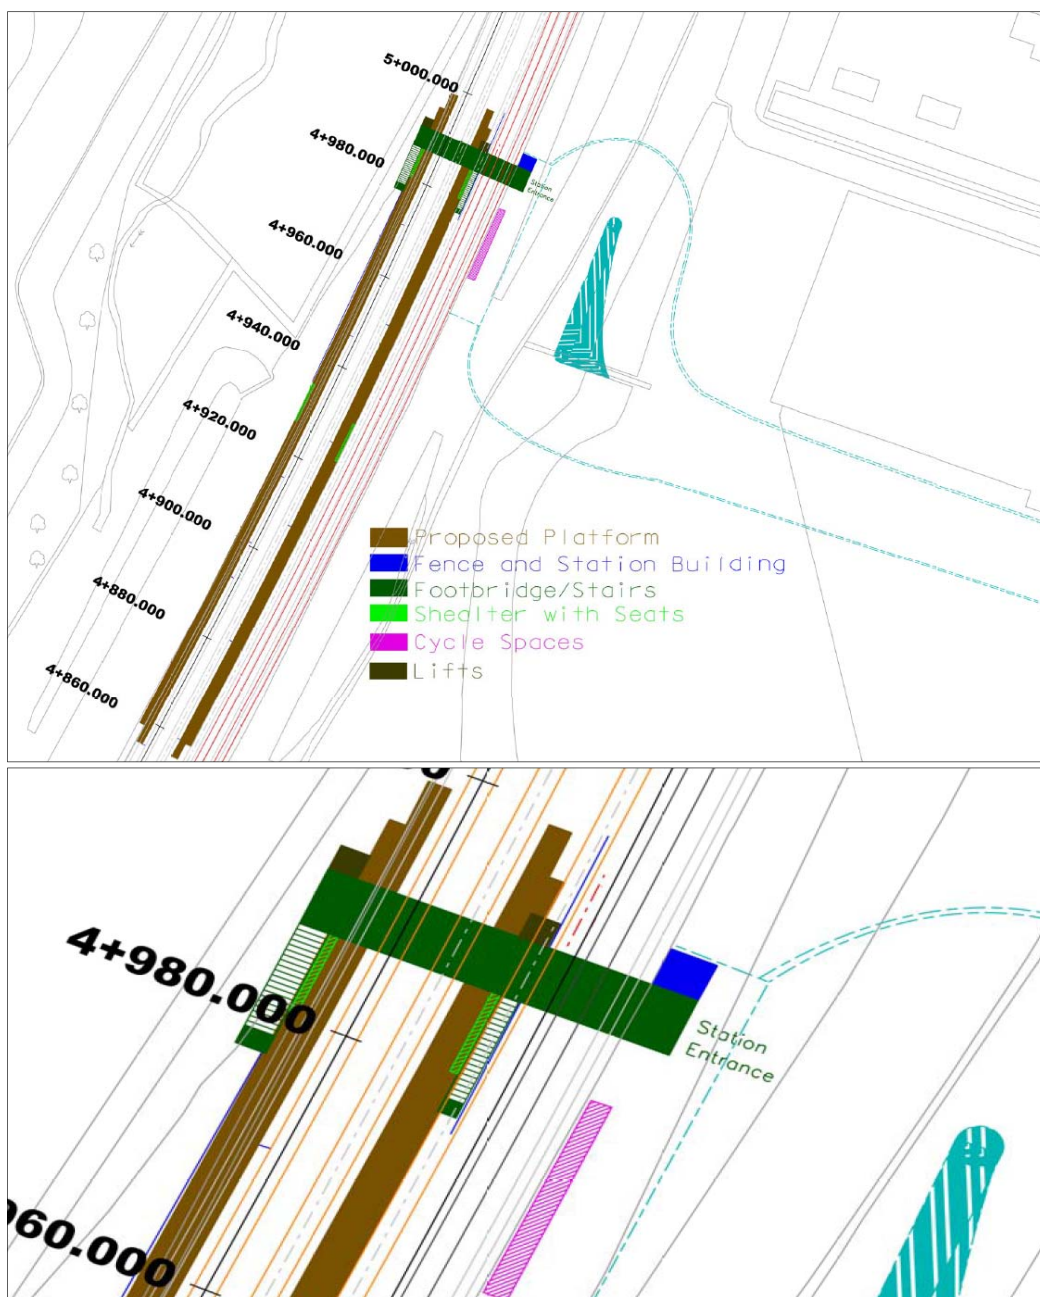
Proposed Station layout Constable Road with operational facilities
